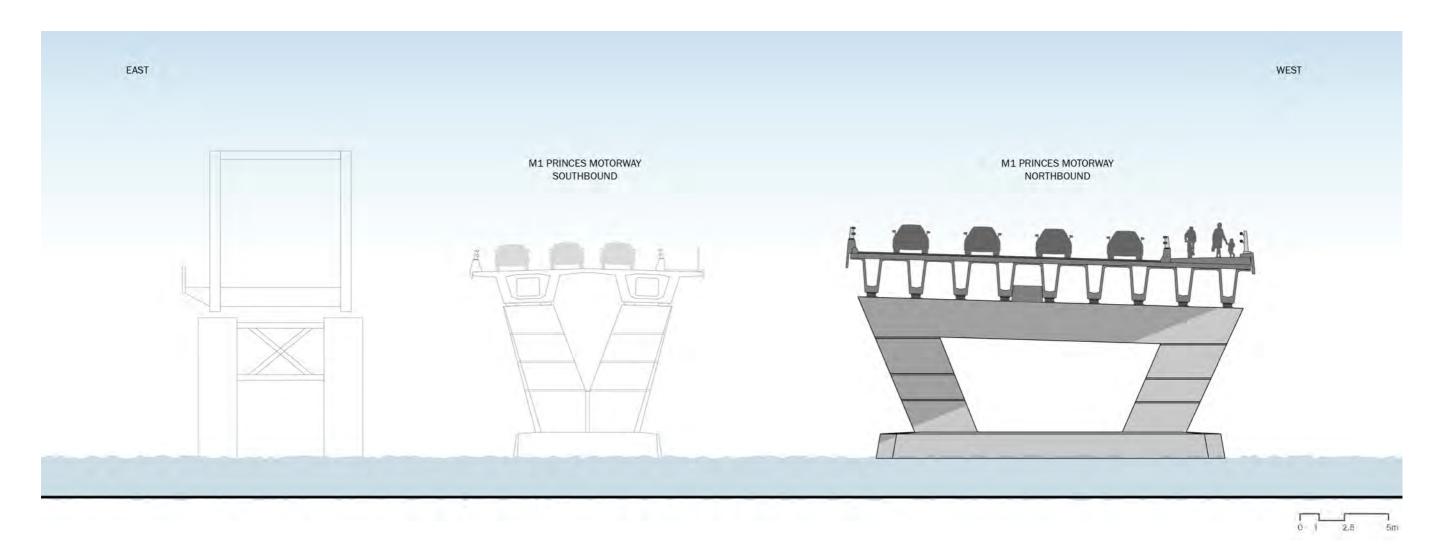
Section through bridge over Shoalhaven River - Super-T Option Note: Subject to further design development and consultation.
